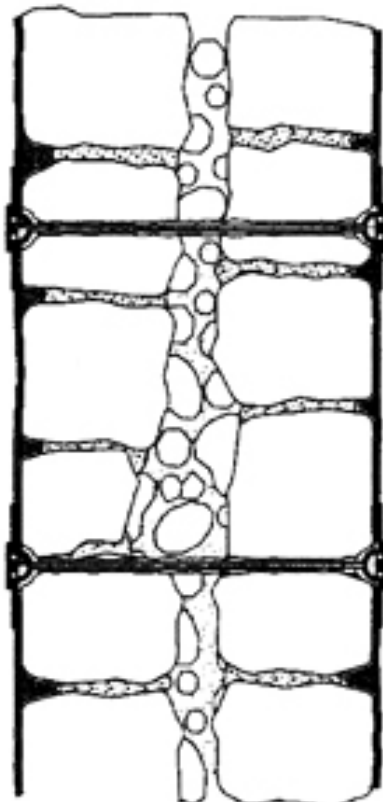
Shear reinforcement of masonry structural elements using steel elements (Silva, 2002)
